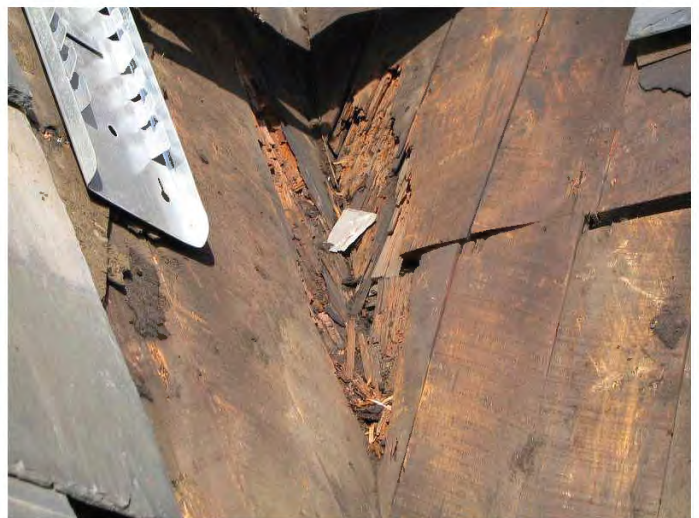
Roof Condition in 2006. *At the time of the major roof renovation, slates were found face nailed to the sheathing, 2006. Photo Courtesy T. McDowell.
